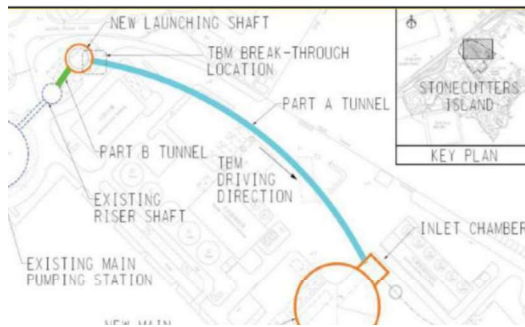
Tunnel layout plan (after Tsang et al. 2012)
